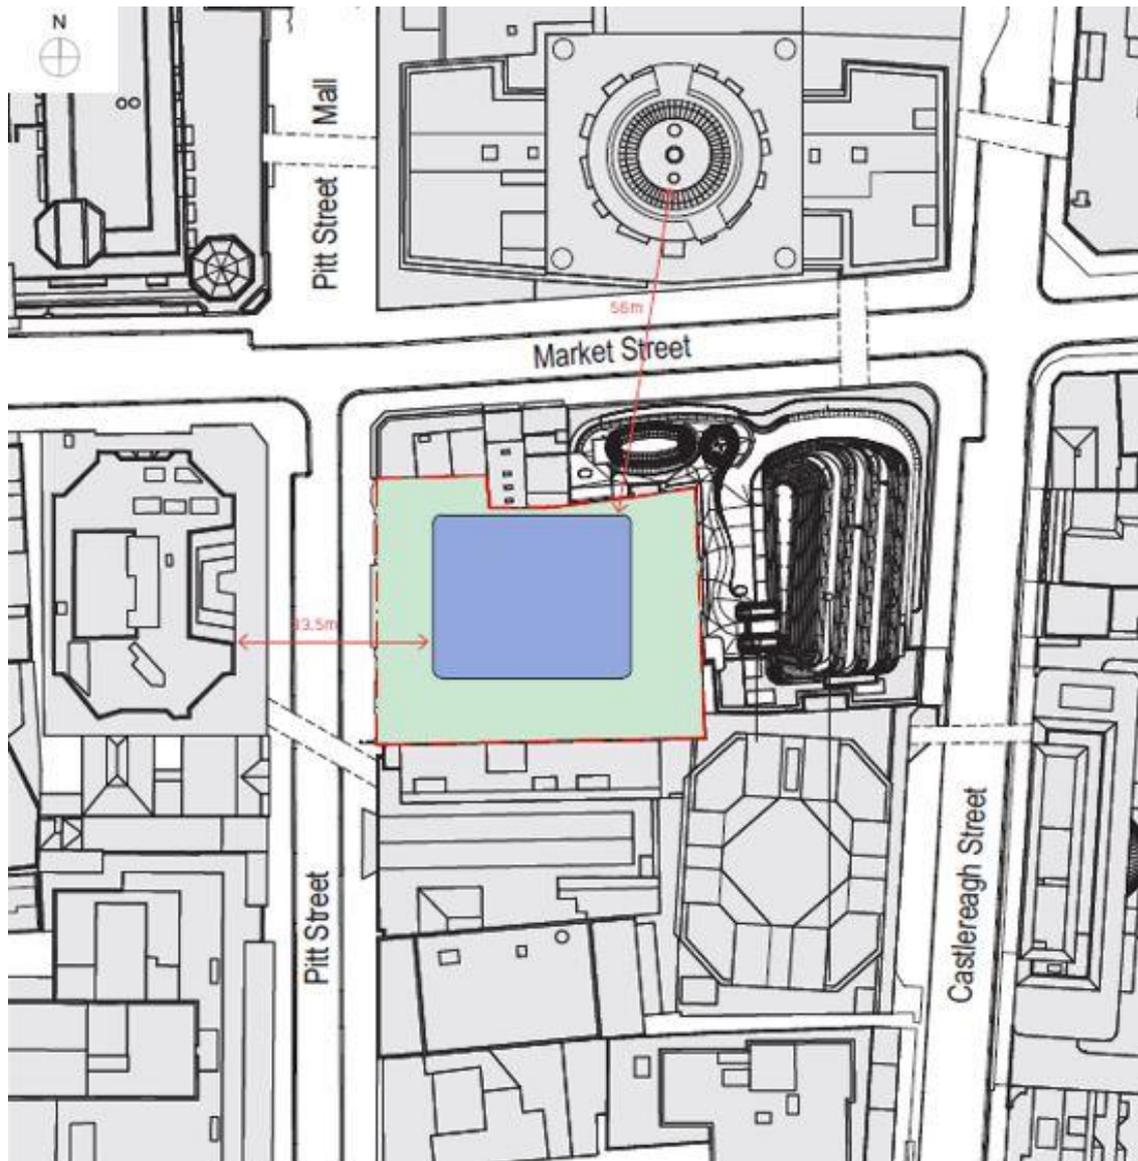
Site plan extract demonstrating separation distances between the proposed tower (in blue) and surrounding development to the north and west
